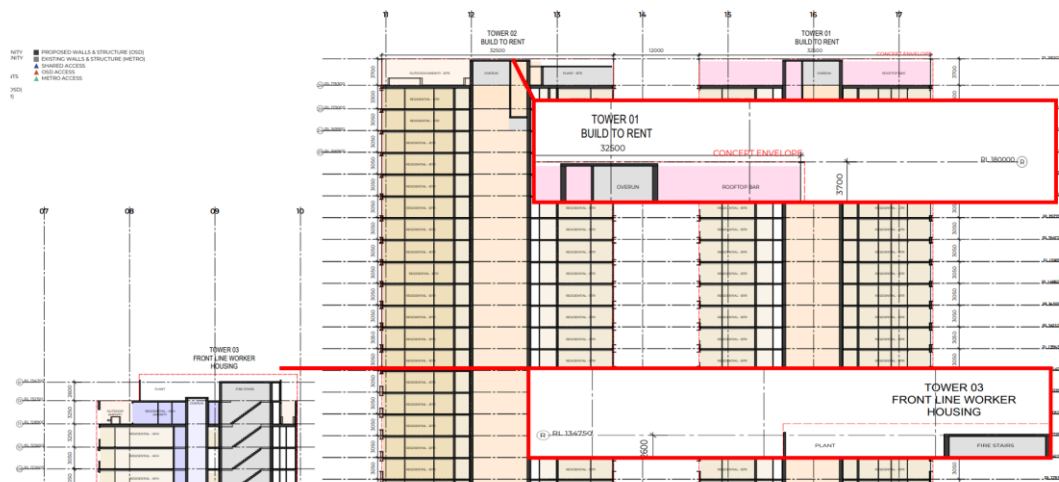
Long Section Exert showing height of buildings, as originally submitted (Source: Woods Bagot)
